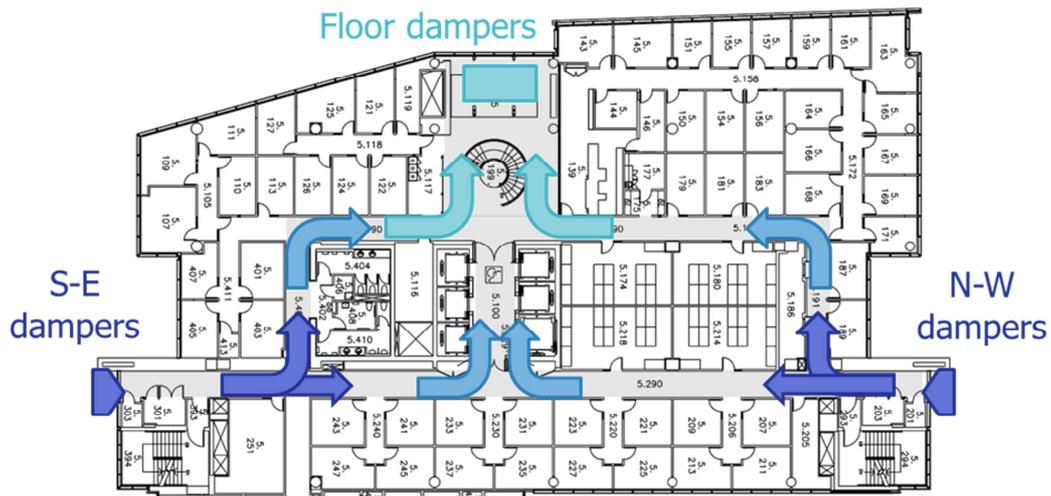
Typical floor plan of the EV building with the expected airflow path.
